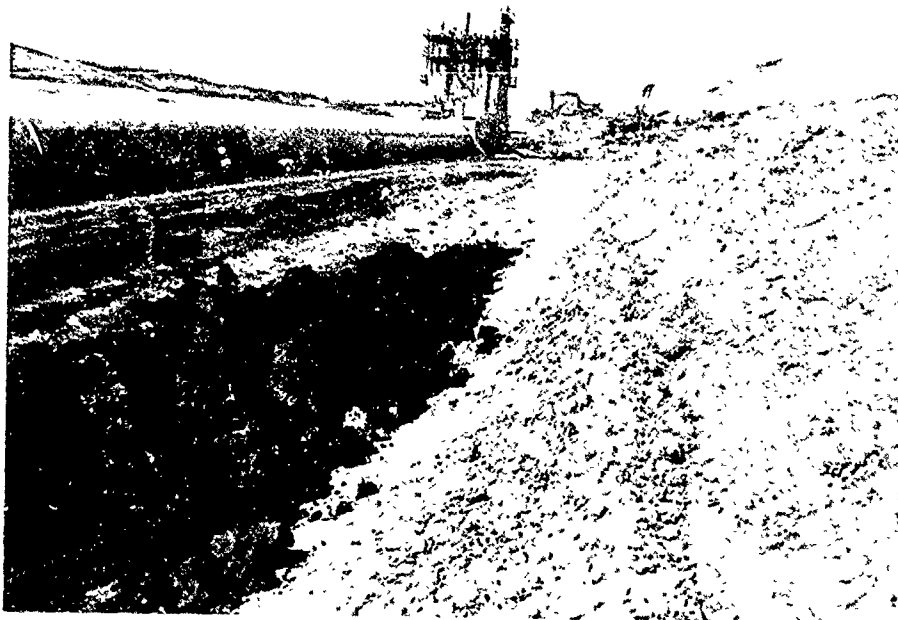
Outlet works conduit, left side, looking upstream. Placing fill on fresh shale surface.
